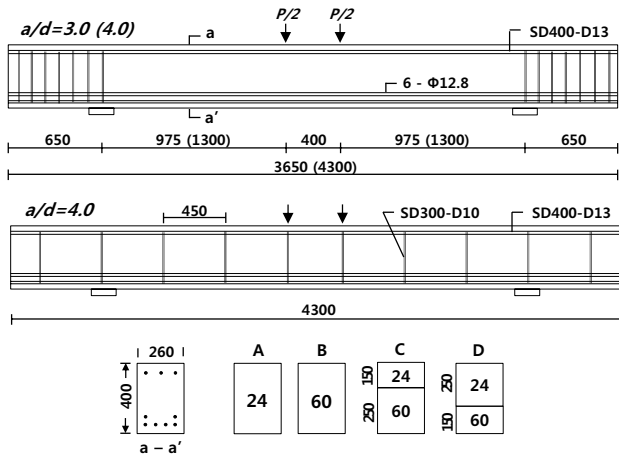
Reinforcement arrangement and cross sections (unit: mm)
